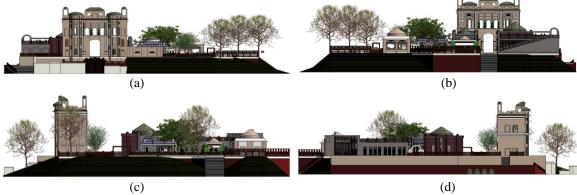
(a) West Elevation, (b) East Elevation, (c) North Elevation (d) South Elevation
